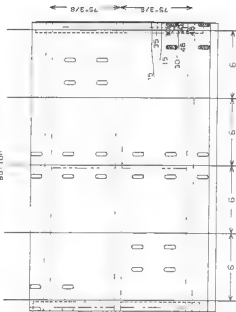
Bottom Cracking Pattern (Fourth Bridge - Test No 5)
